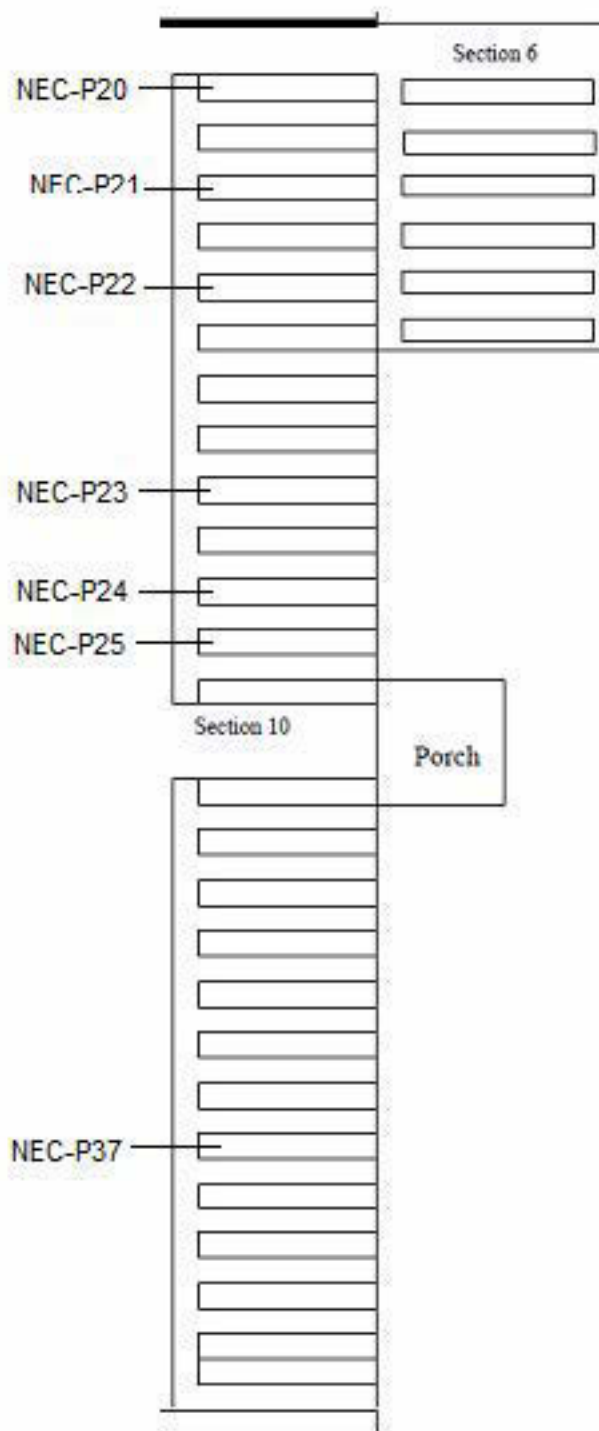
Plan of south aisle, showing the location of samples NEC-P20–25 and NEC-P37
